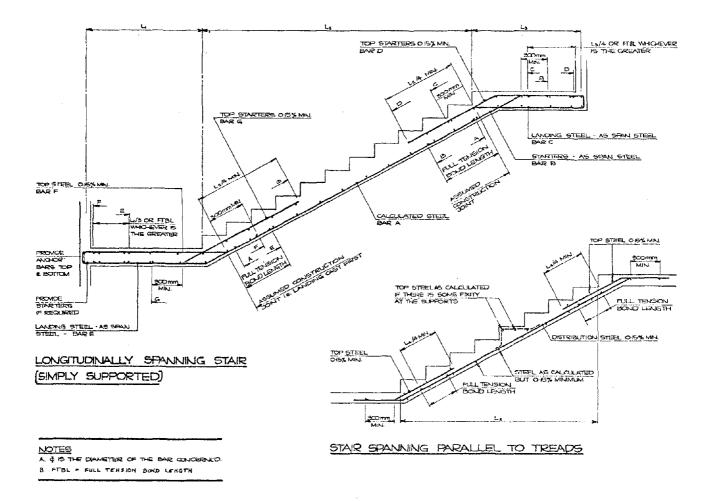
Concrete stairway detail. (Diagram from <u>Earthquake Resistant Design</u>, by David J. Dowrick, John Wiley & Sons, Ltd., 1977. Used with permission of John Wiley & Sons, Ltd.)
